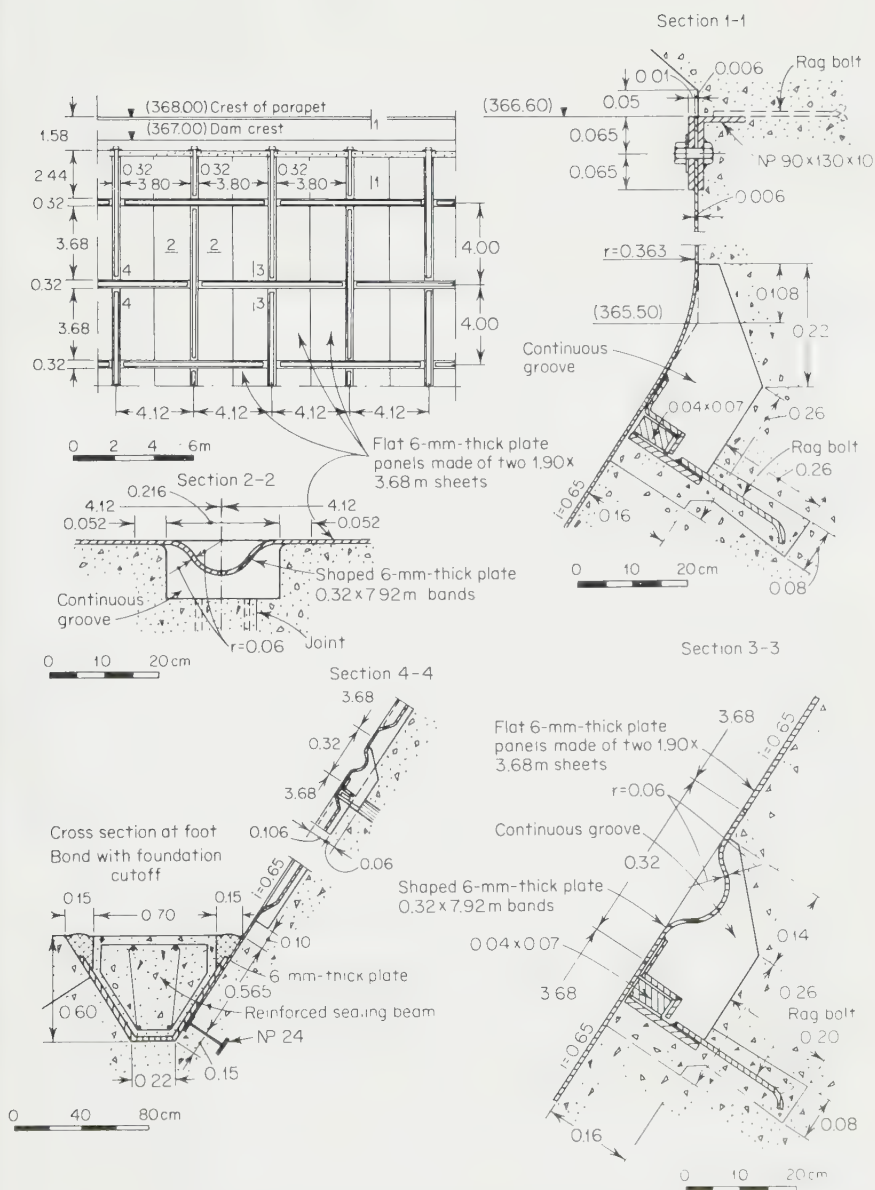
Details of steel membrane on the upstream face of Pozzillo Dam.
